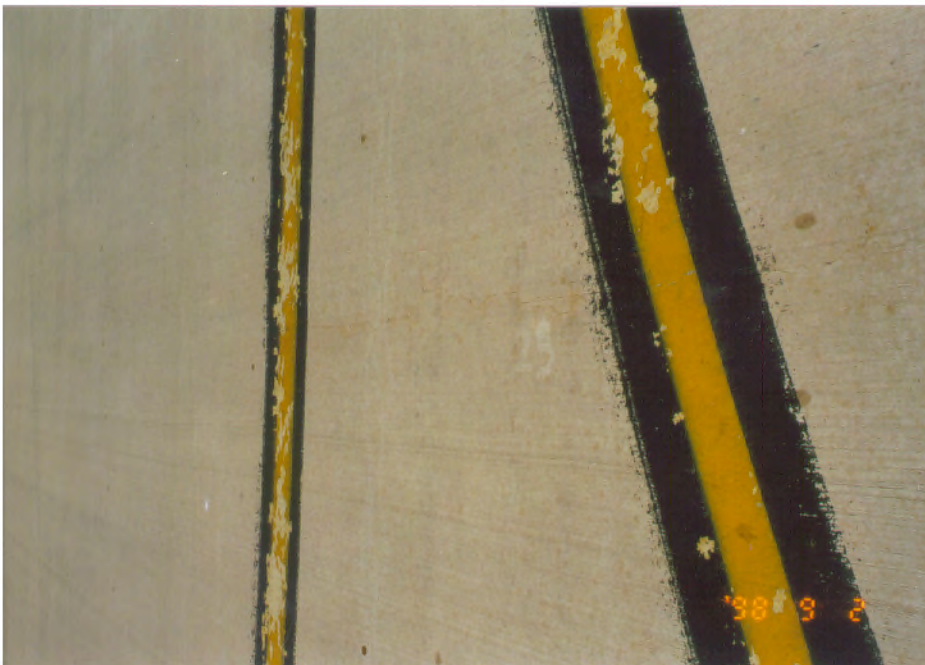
CRACK NO. 23 IN THE FIBROUS PAVEMENT, A TRANSVERSE CRACK (SEPT. 1998)
